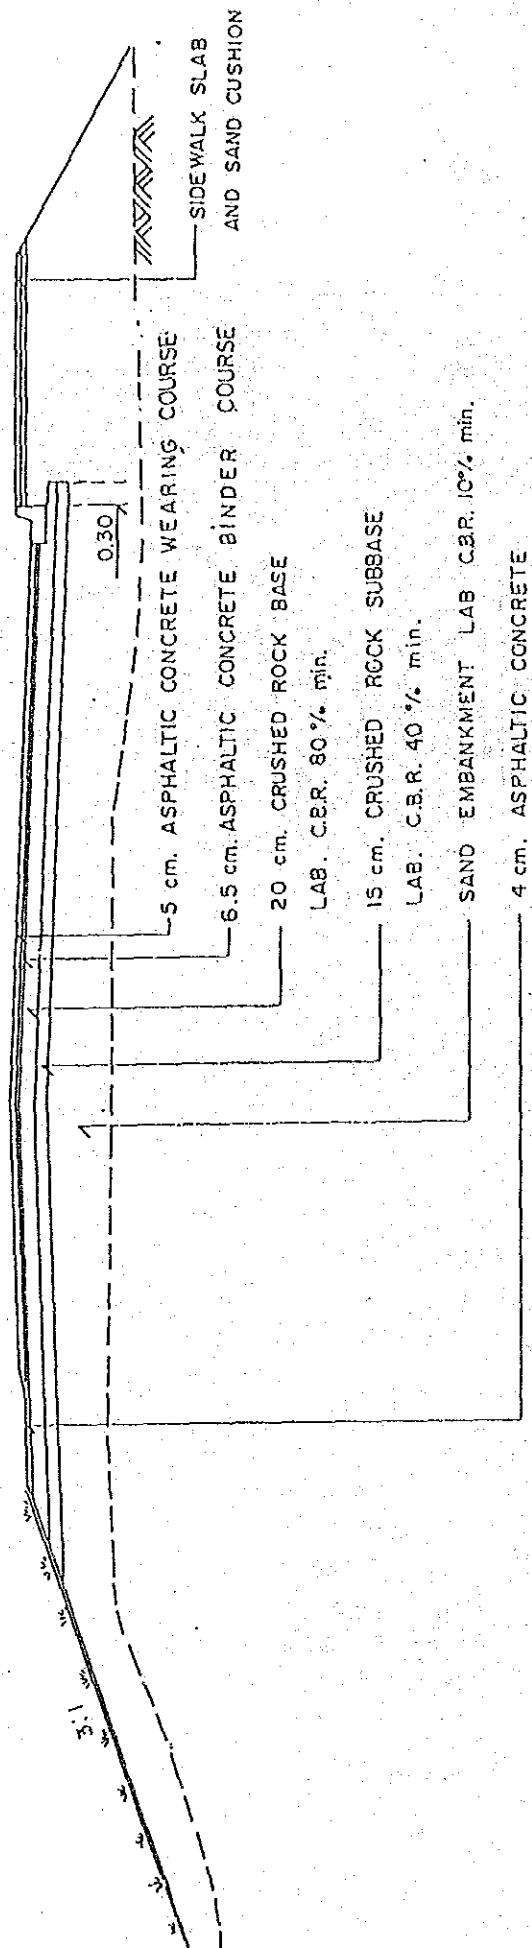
Typical Cross Section for At-Grade Street
